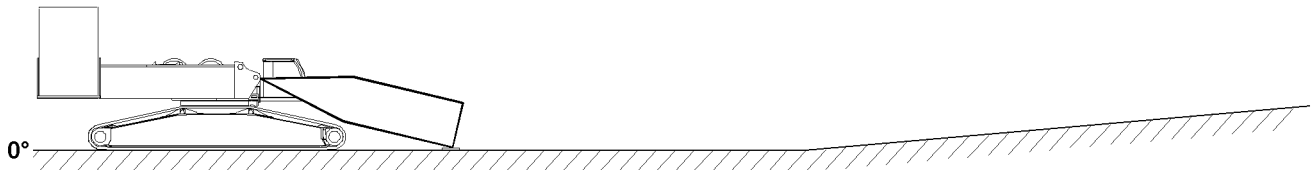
Disassembling and removing the boom - intermediate sections to the boom - pivot section
